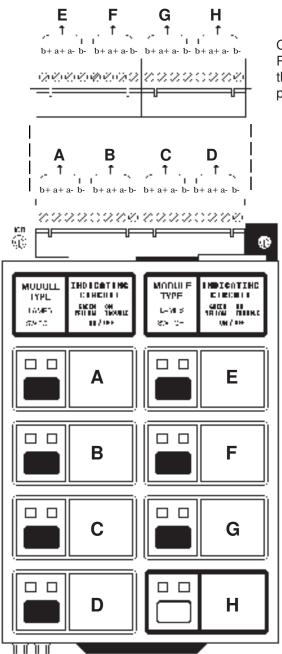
Style D Field Wiring of IZM-8 Initiating Zone Module with IZE-A Expander
